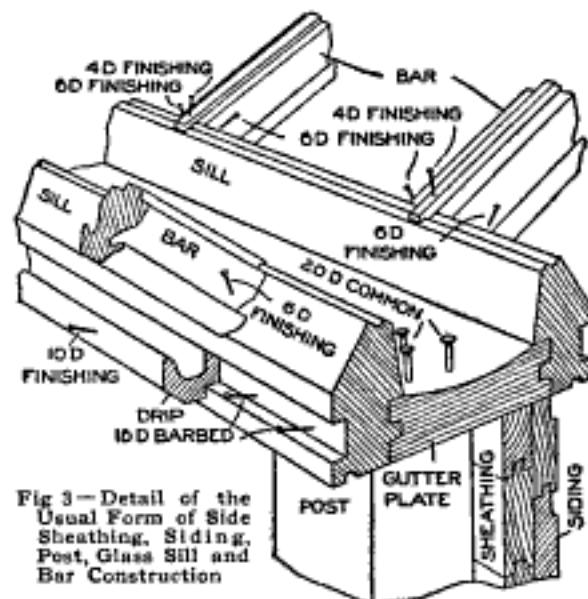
Detail of the Usual Form of Side Sheathing, Siding, Post, Glass Sill and Bar Construction
